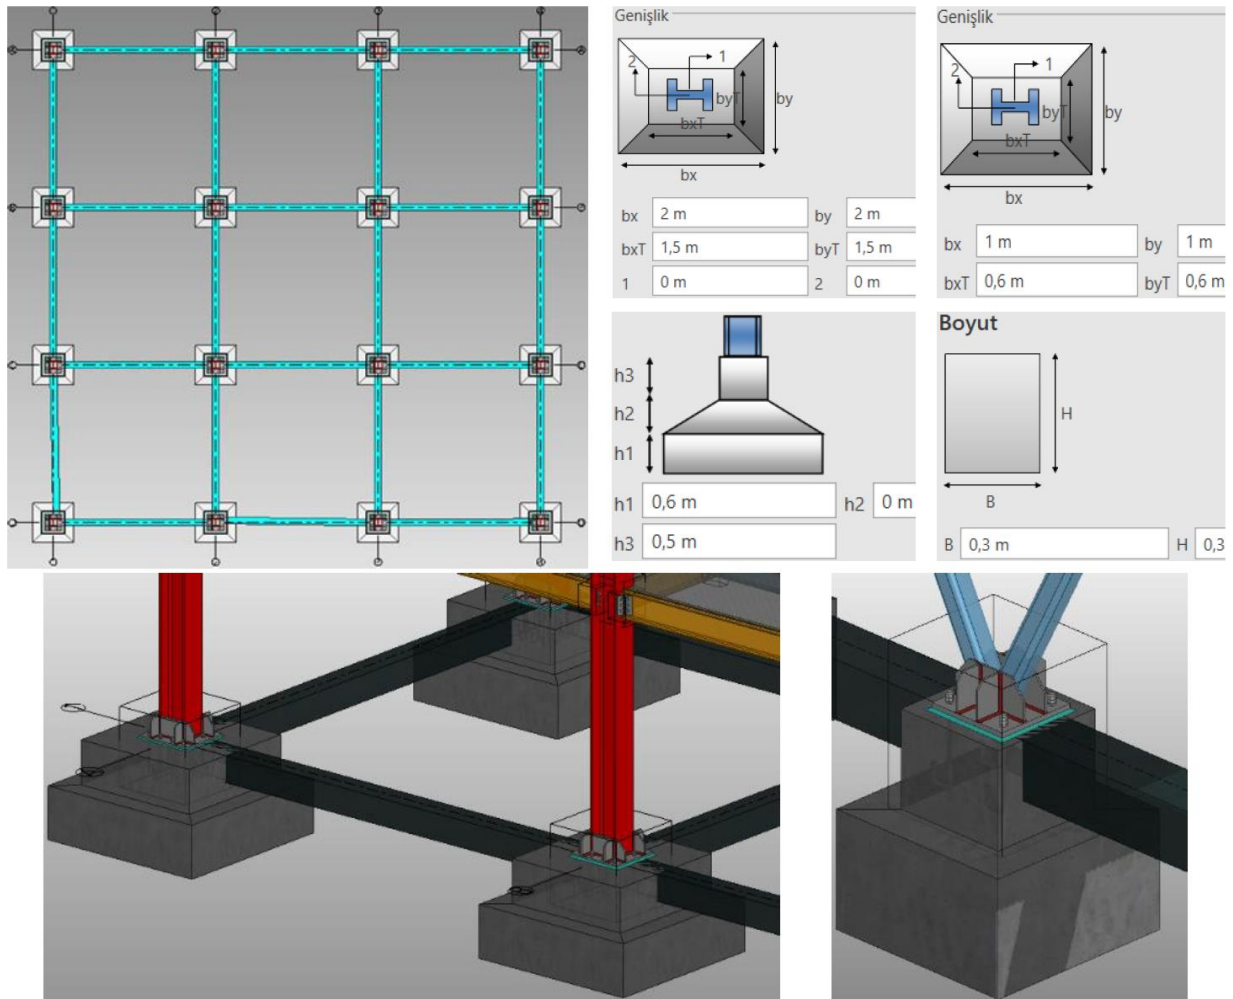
Views from the foundation plan and foundation detail-dimensions of building models.
